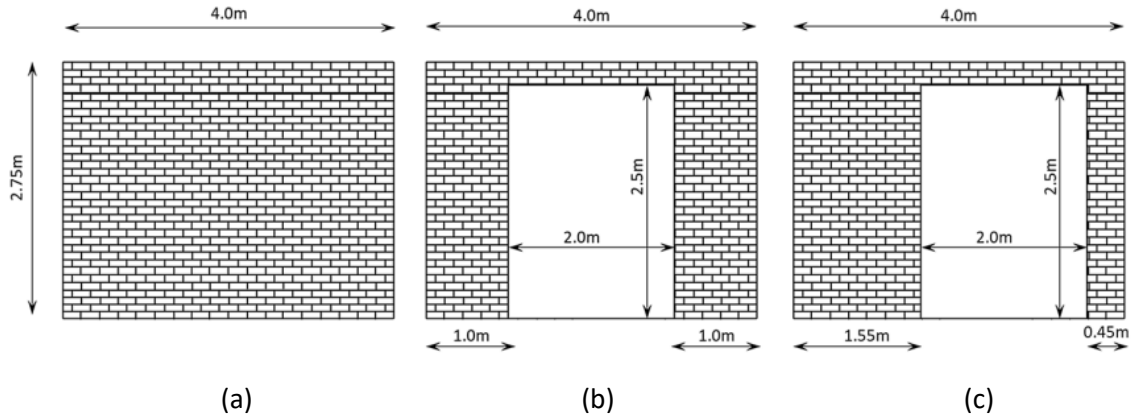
The geometry of the models developed: (a) wall panel with no opening/solid wall; (b) wall panel with symmetric opening; (c) wall panel with asymmetric opening.
